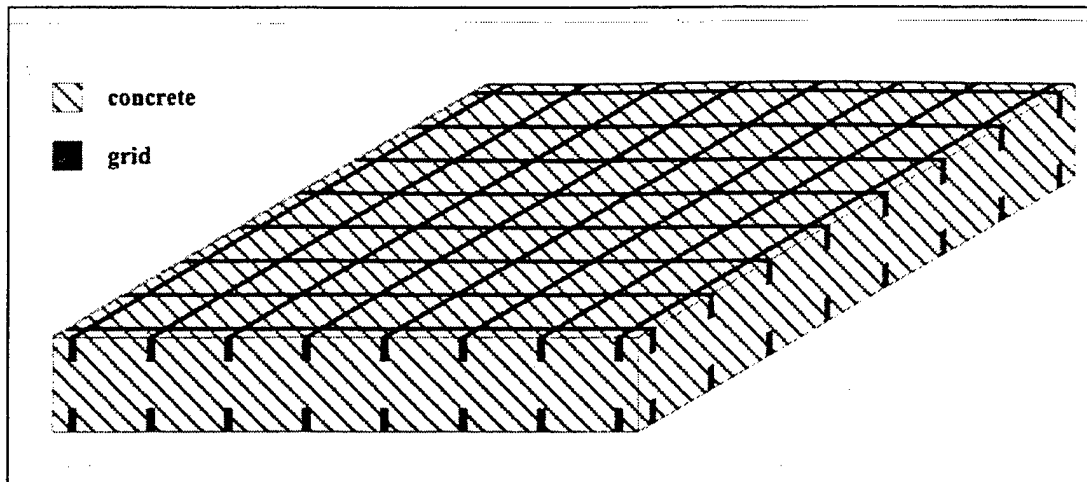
Grid reinforced concrete slab (concrete contained within a bi-grid frame).
